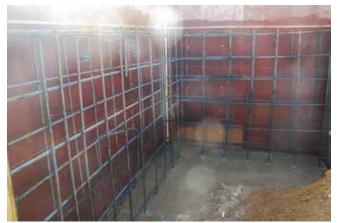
Formwork and reinforcing bar for L-shaped wall
